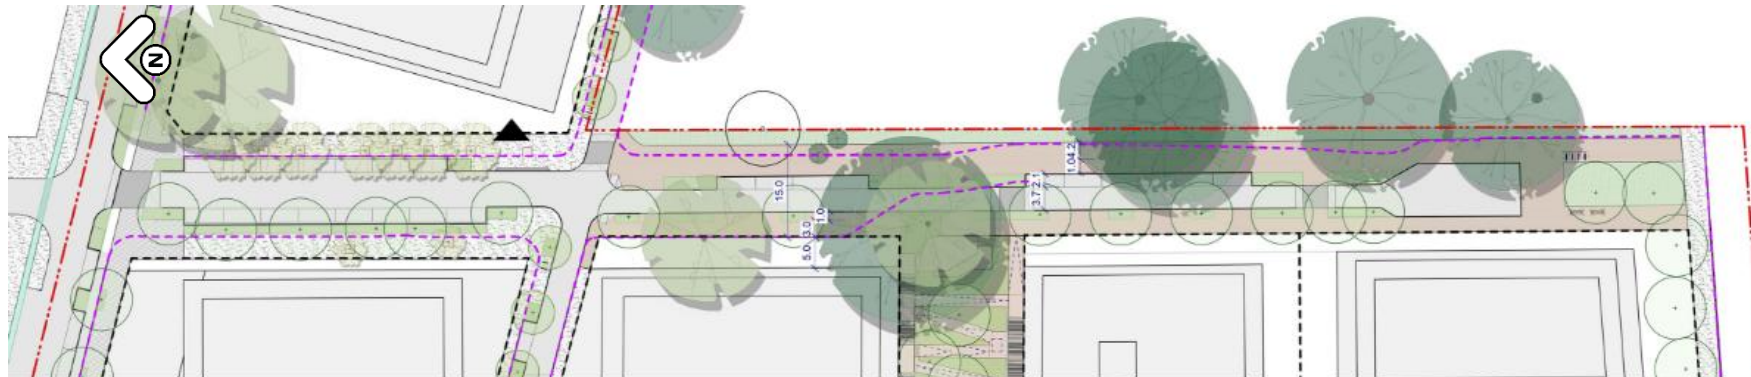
Street Plan - Pitt Street (Aspect Studios)
